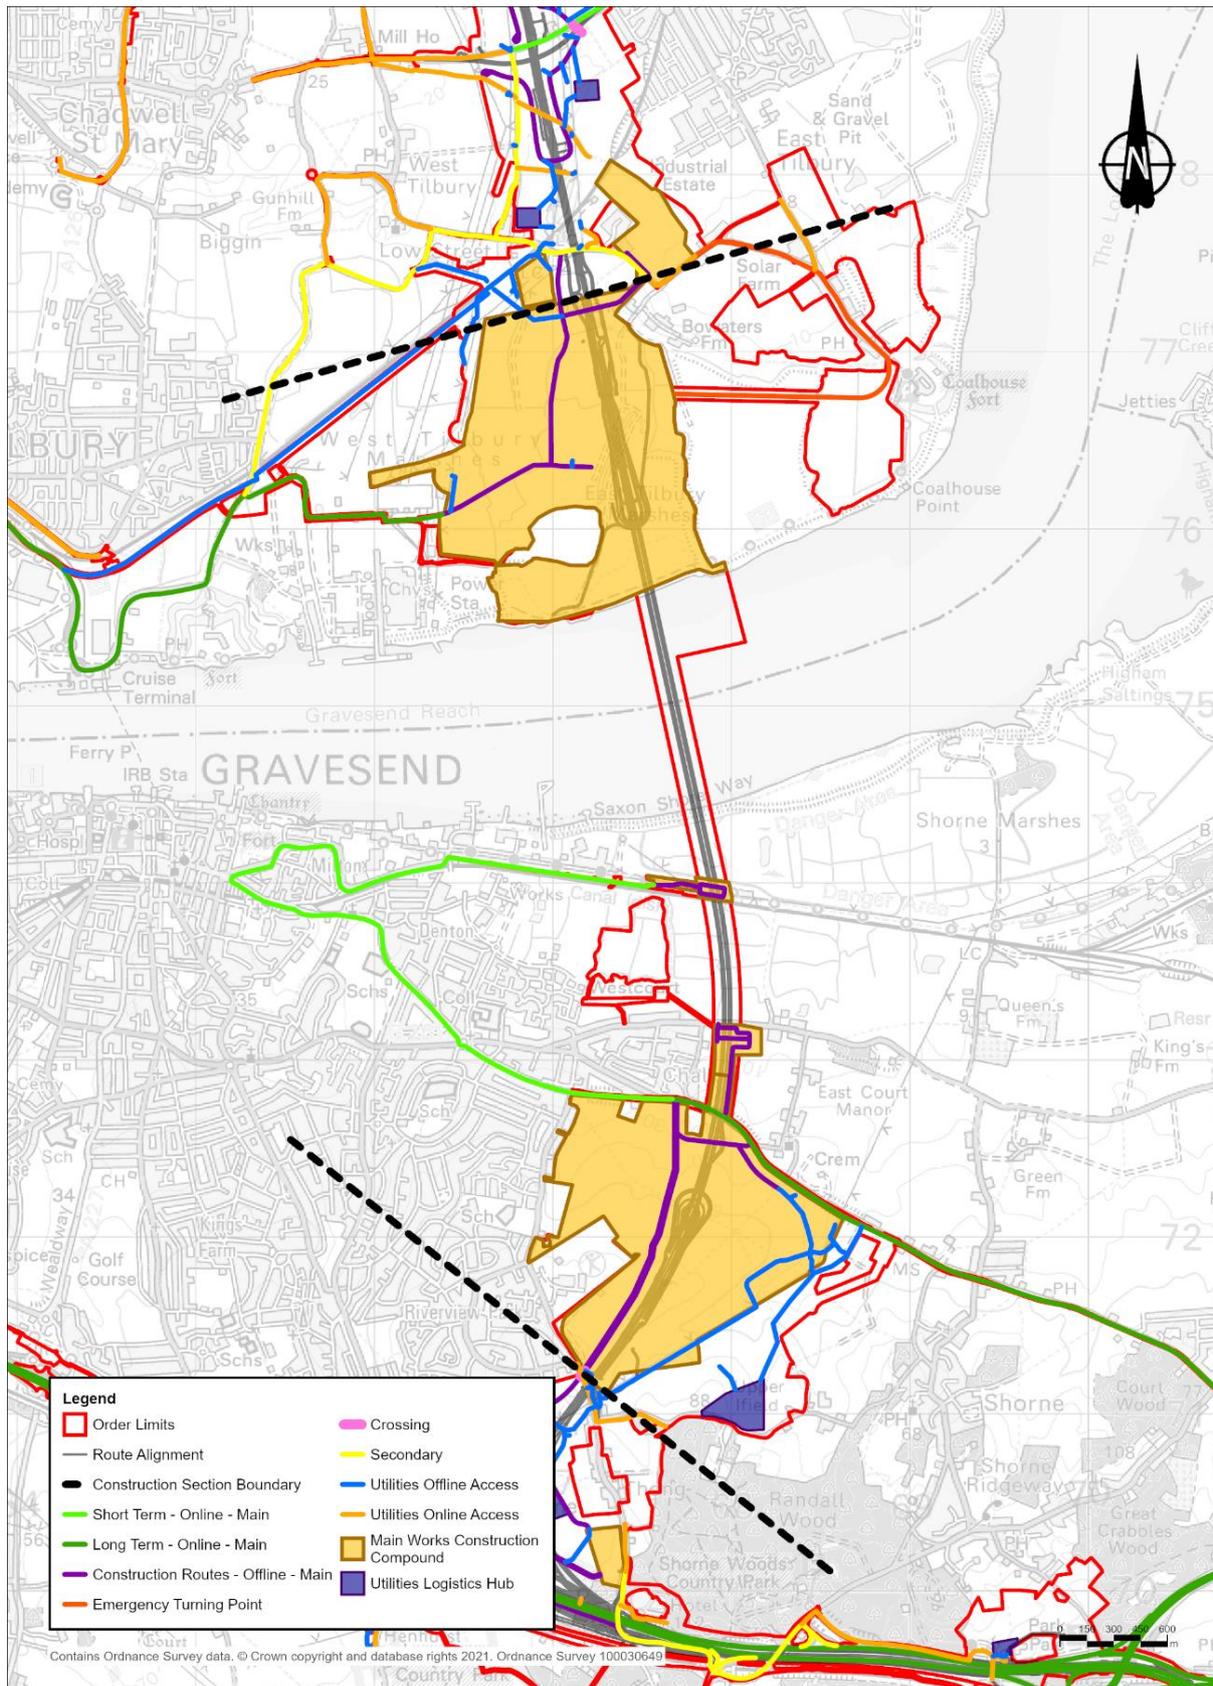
Compounds, ULH and HGV construction traffic routes including Utilities (North Portal to A13)
